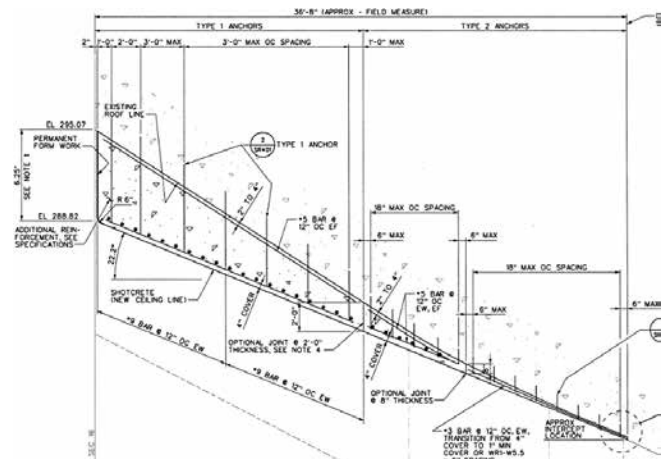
Sectional view of reinforced shotcrete modifications to draft tube
